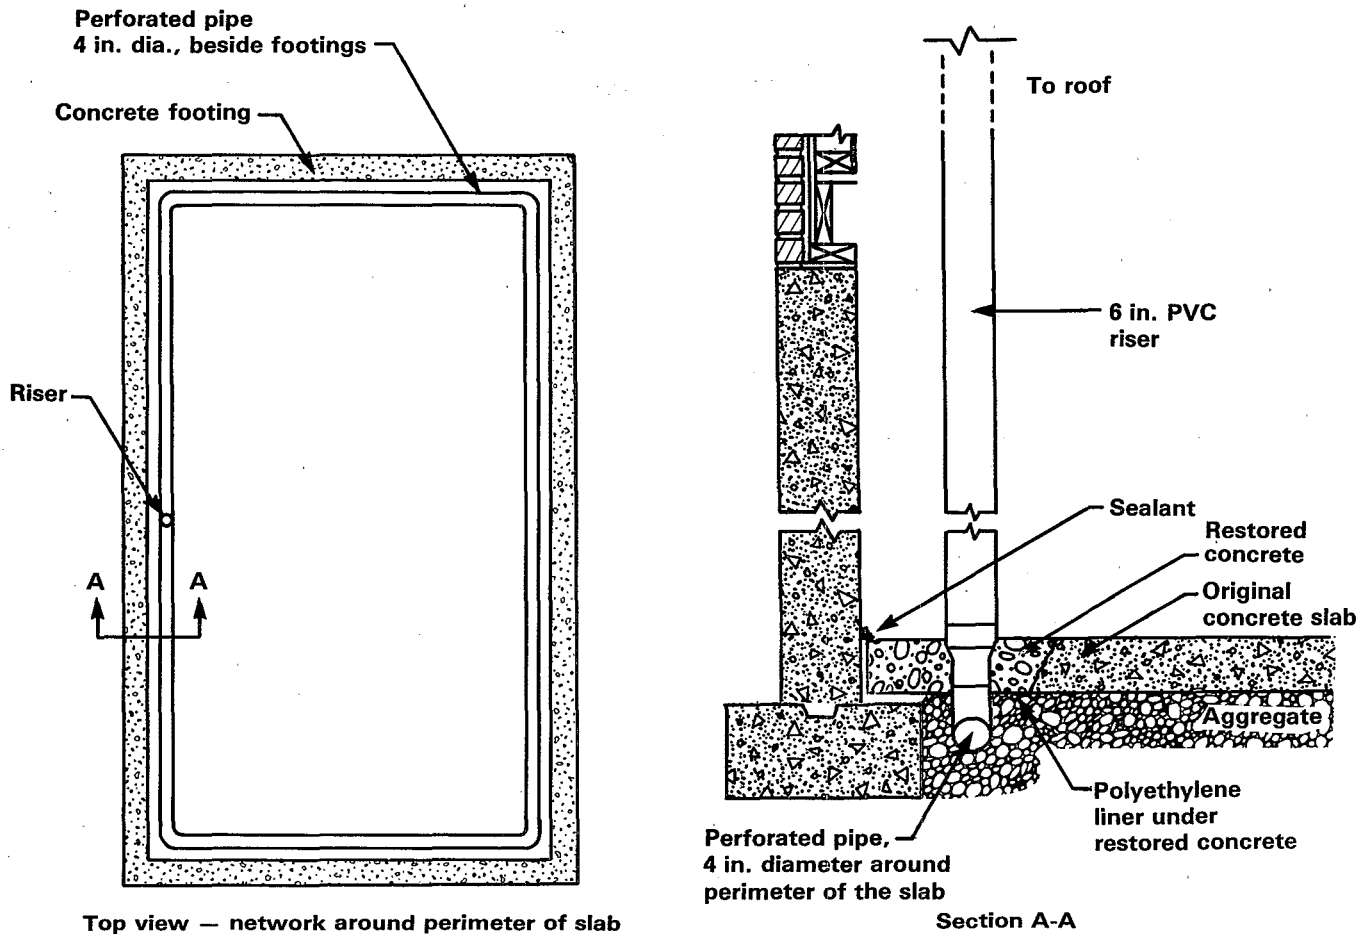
Passive sub-slab ventilation system involving loop of perforated piping around footings.
